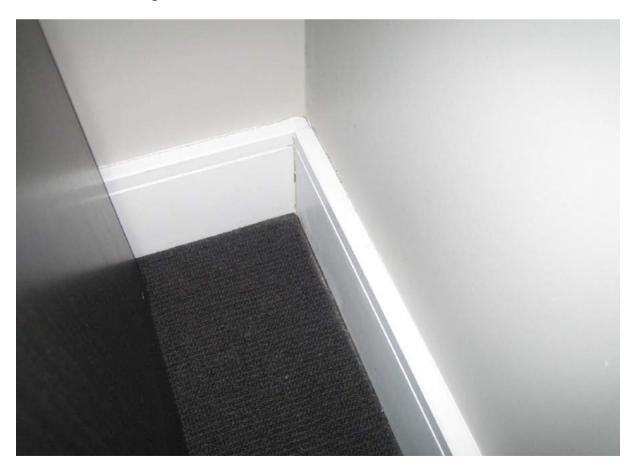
Water damage to skirting in the S/E corner of bedroom 1 to Unit 101.
